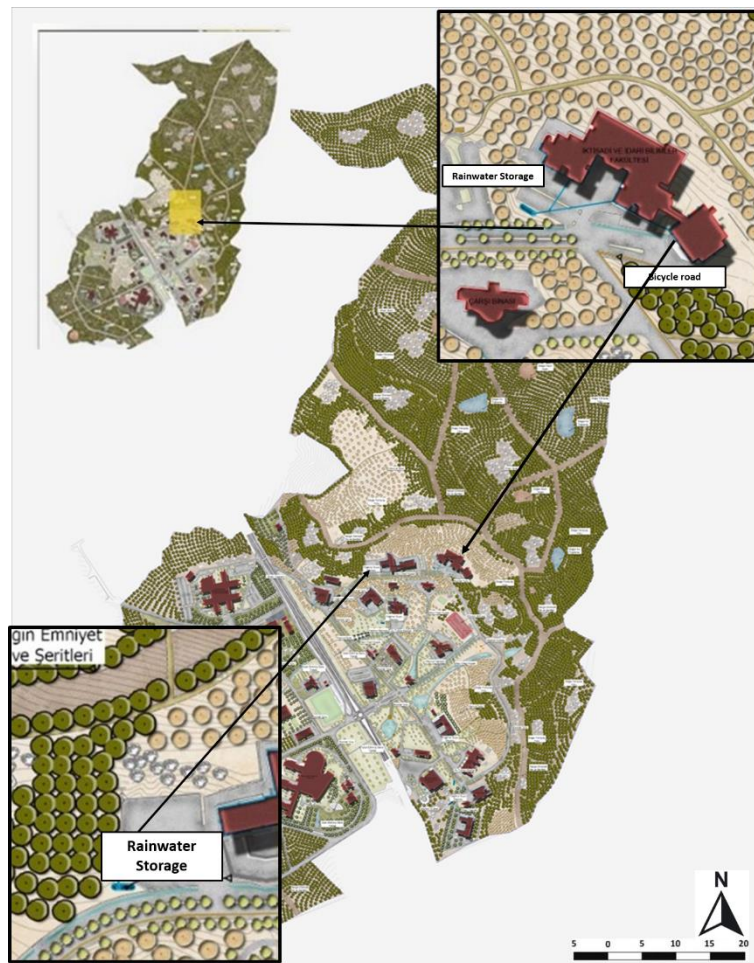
An example of stormwater management for Yozgat Bozok University (Layout 1)
